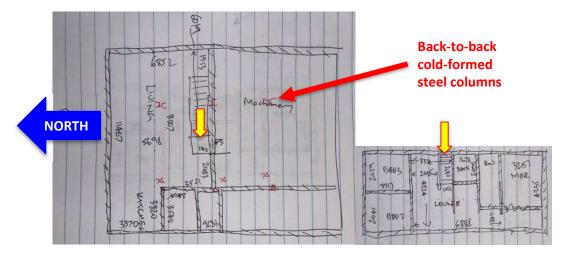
Secondary dwelling and machinery shed floor layout plan (left-frame) and first floor (right-frame), showing Hebel masonry walls at ground floor level.
